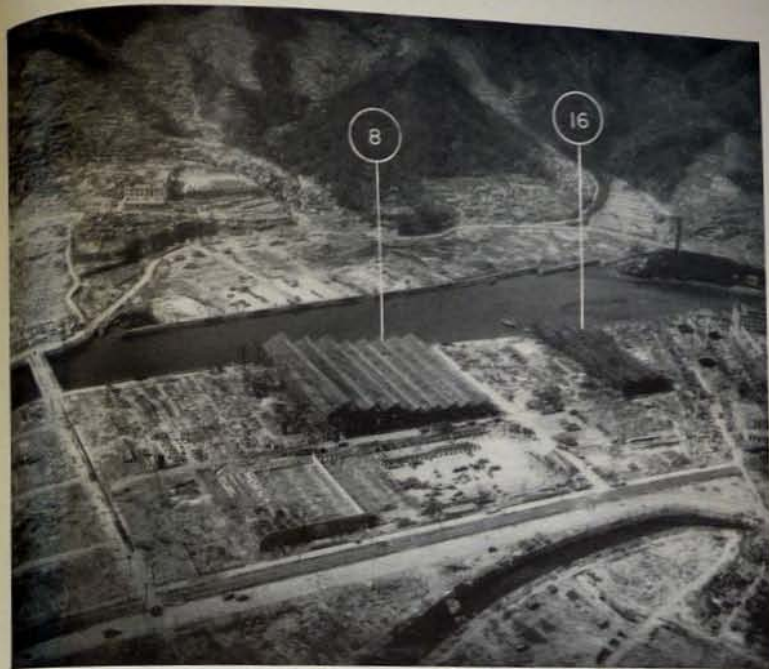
5,600 feet from GZ. Group 36. Aerial view, looking west. Mitsubishi Turbine Component Works.
